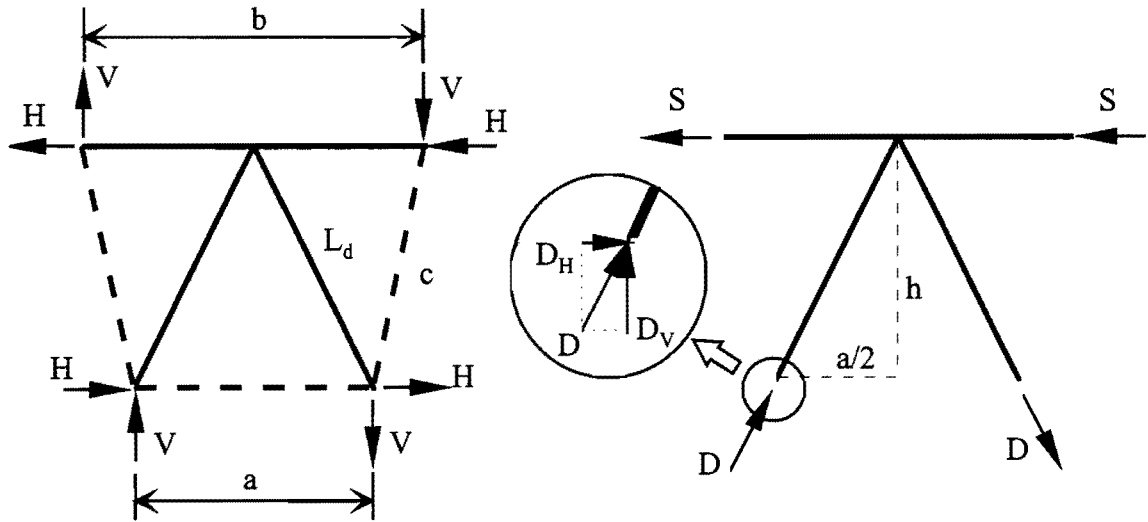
Static Equilibrium of Internal K-Frames in Box Girders with Distortional Load
